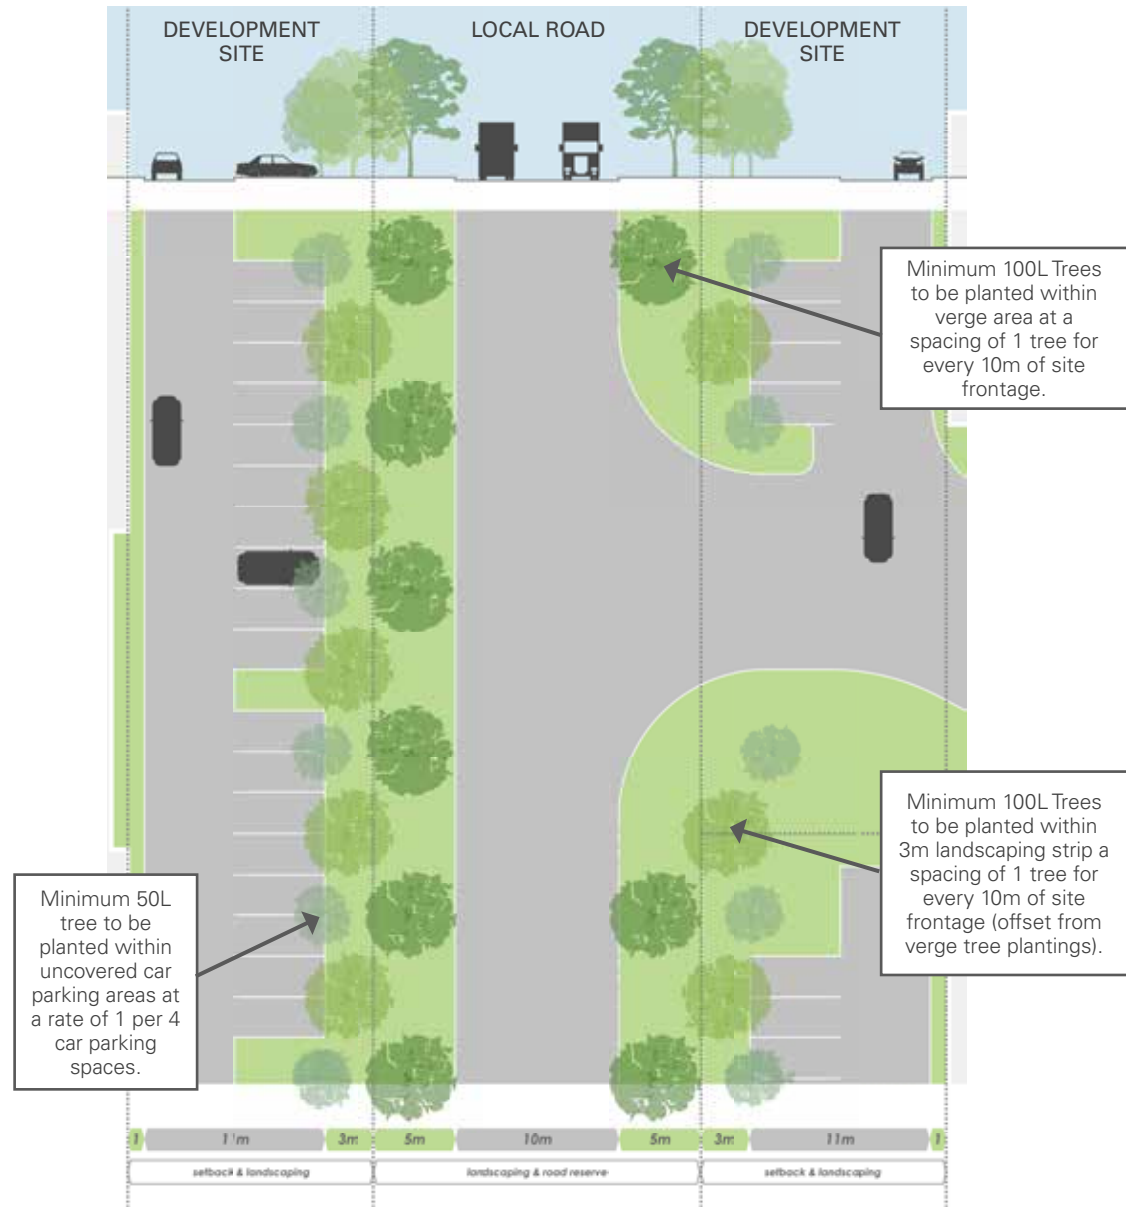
Cross section outlining the primary street frontage landscaping requirements within front setback area and road verge in accordance with the development controls under section 2.5.1 and 2.5.2.
